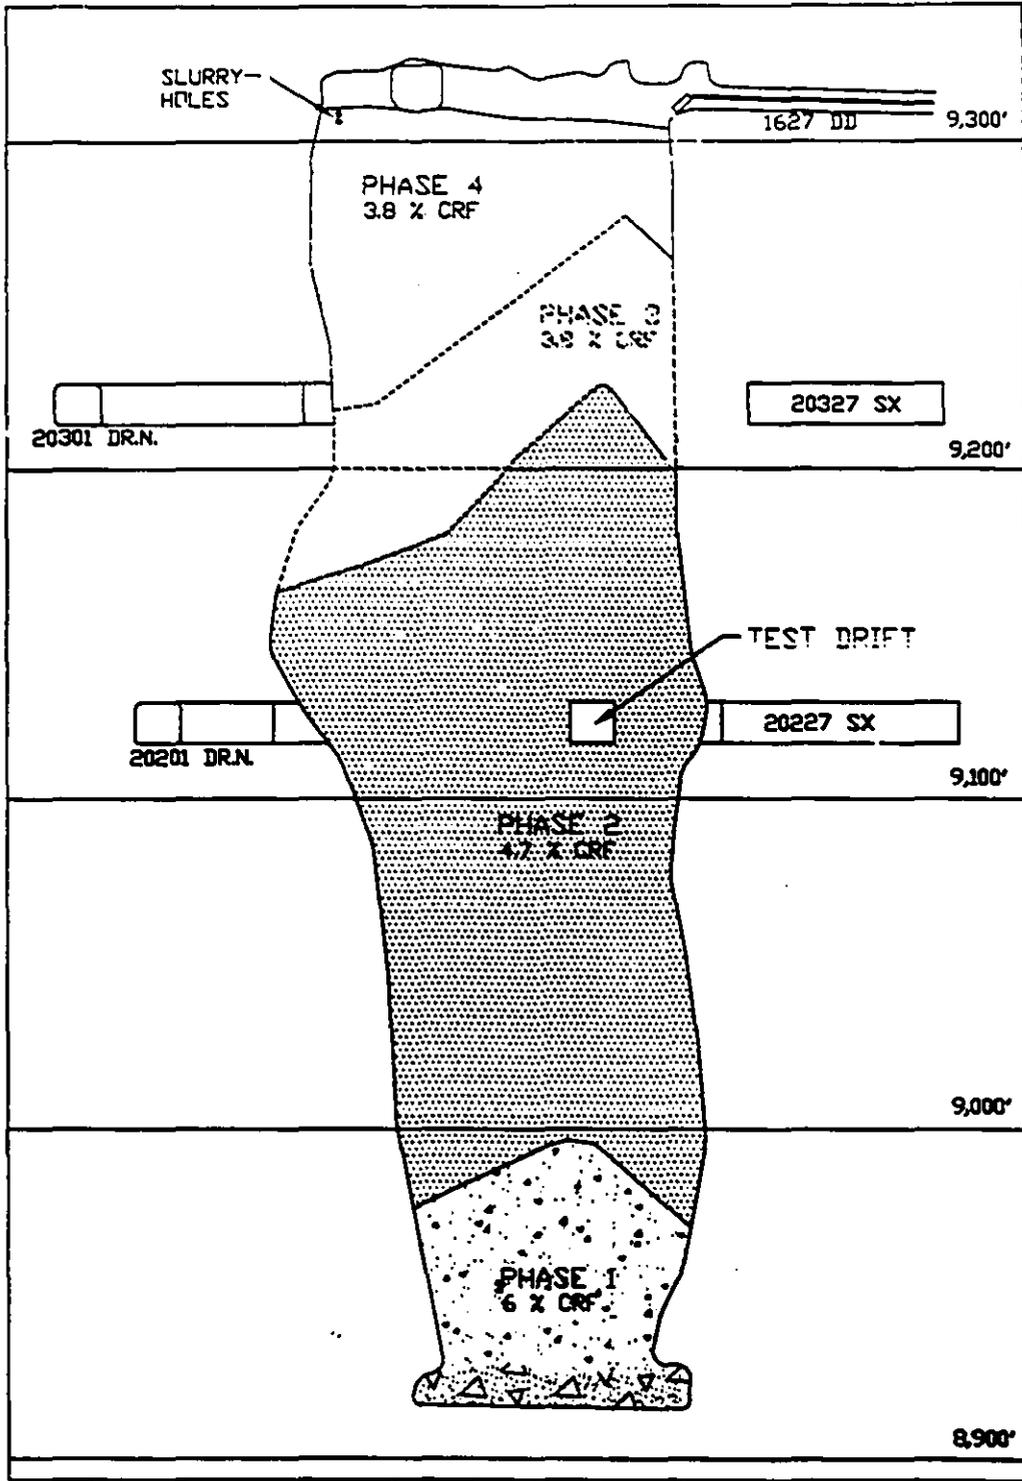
2027-L-ST LOOKING NORTH
